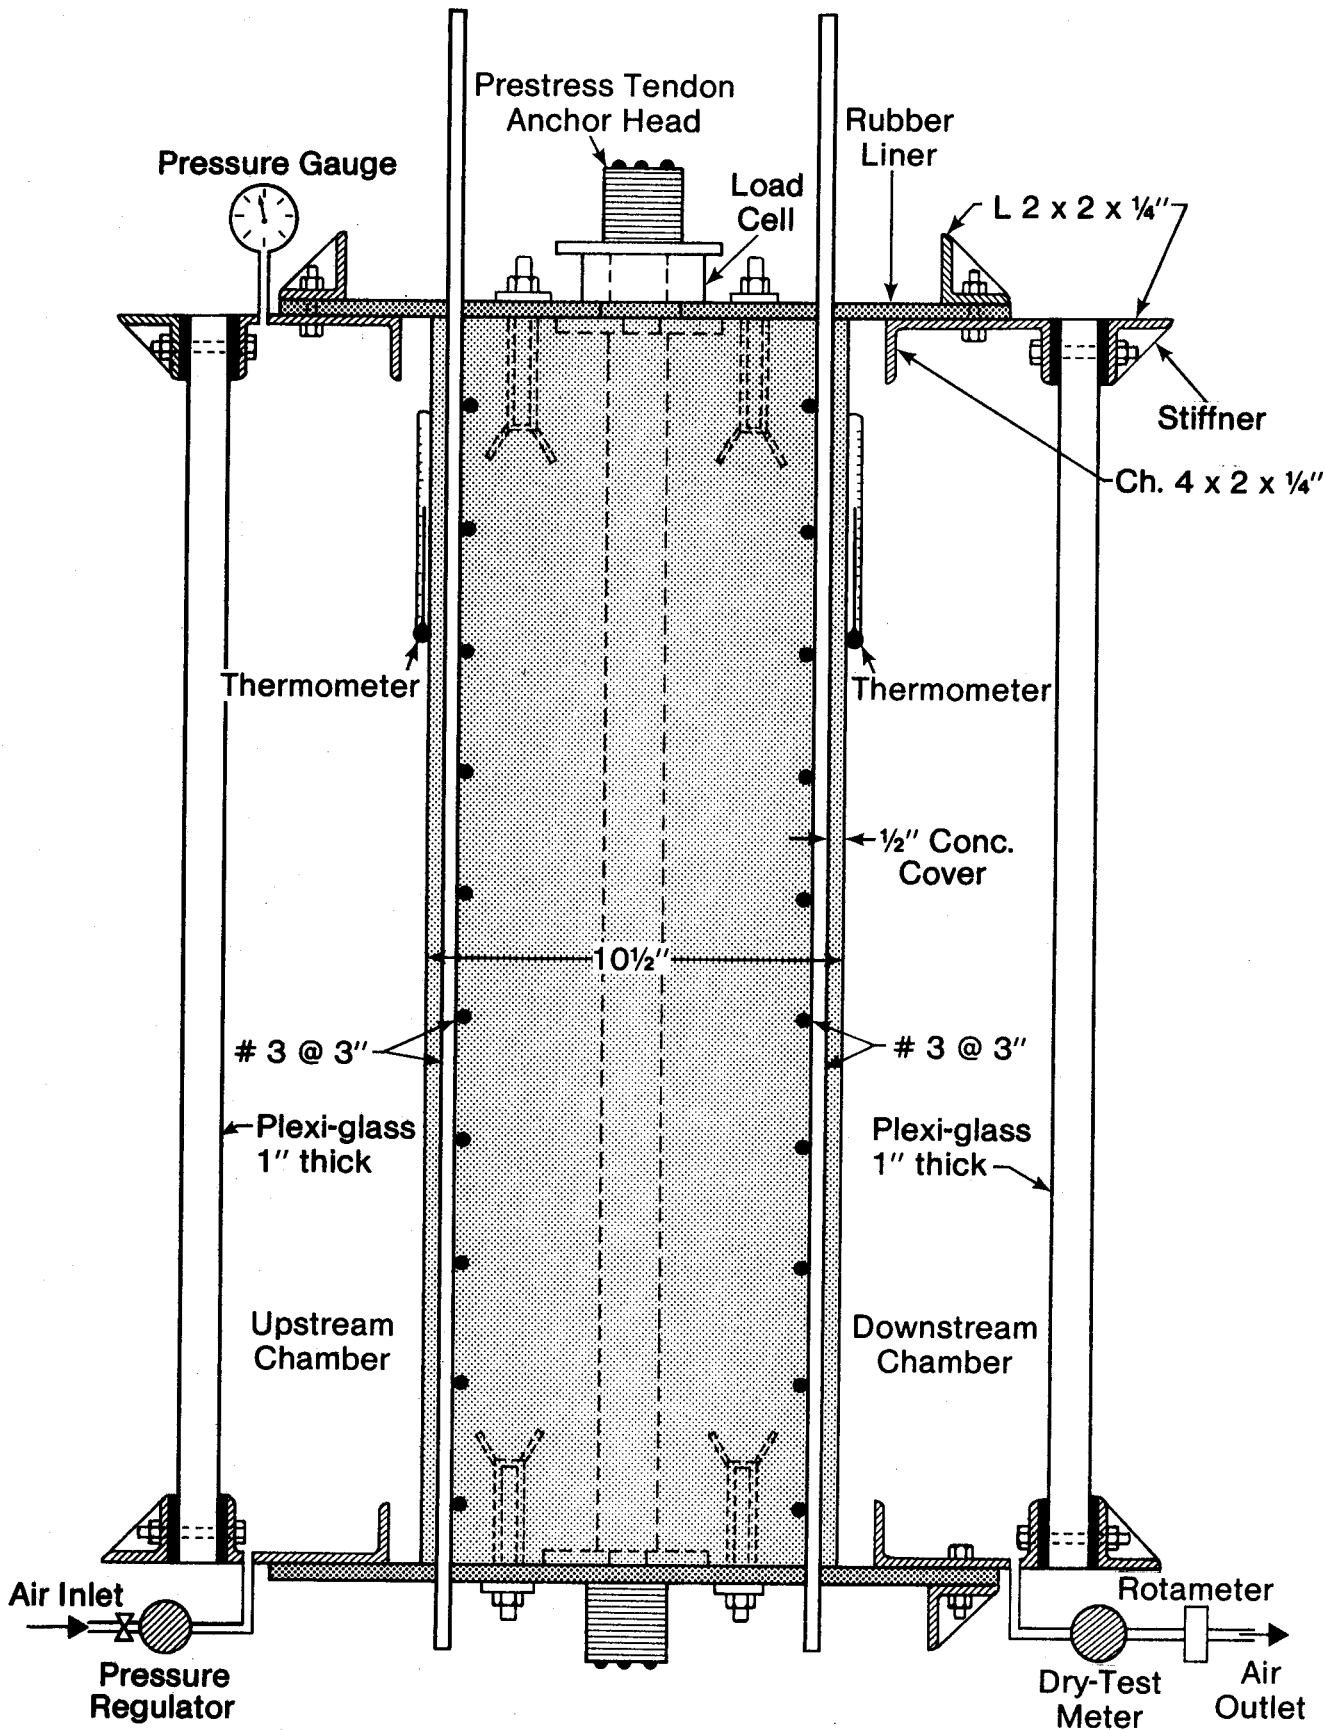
Details of Air Chambers and Rubber Liners, Segment 10
